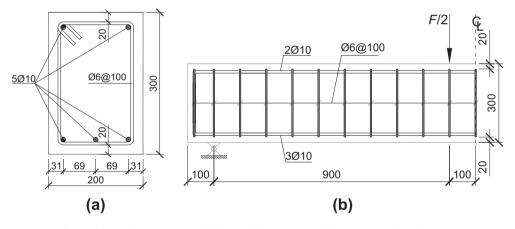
RC beam: (a) cross section; (b) longitudinal view. Note: all dimensions are in millimetres.
